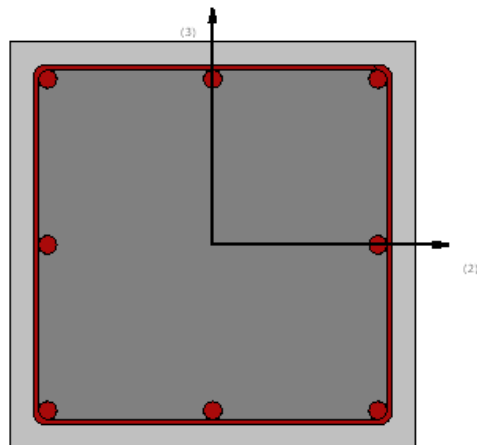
Rectangular column section 0.45x0.45 (8 No.20) for floor (4, 5, and 6).
